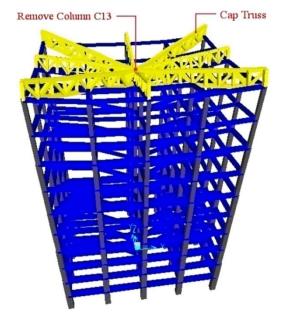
Preventing sudden progressive failure of members by cap truss system
